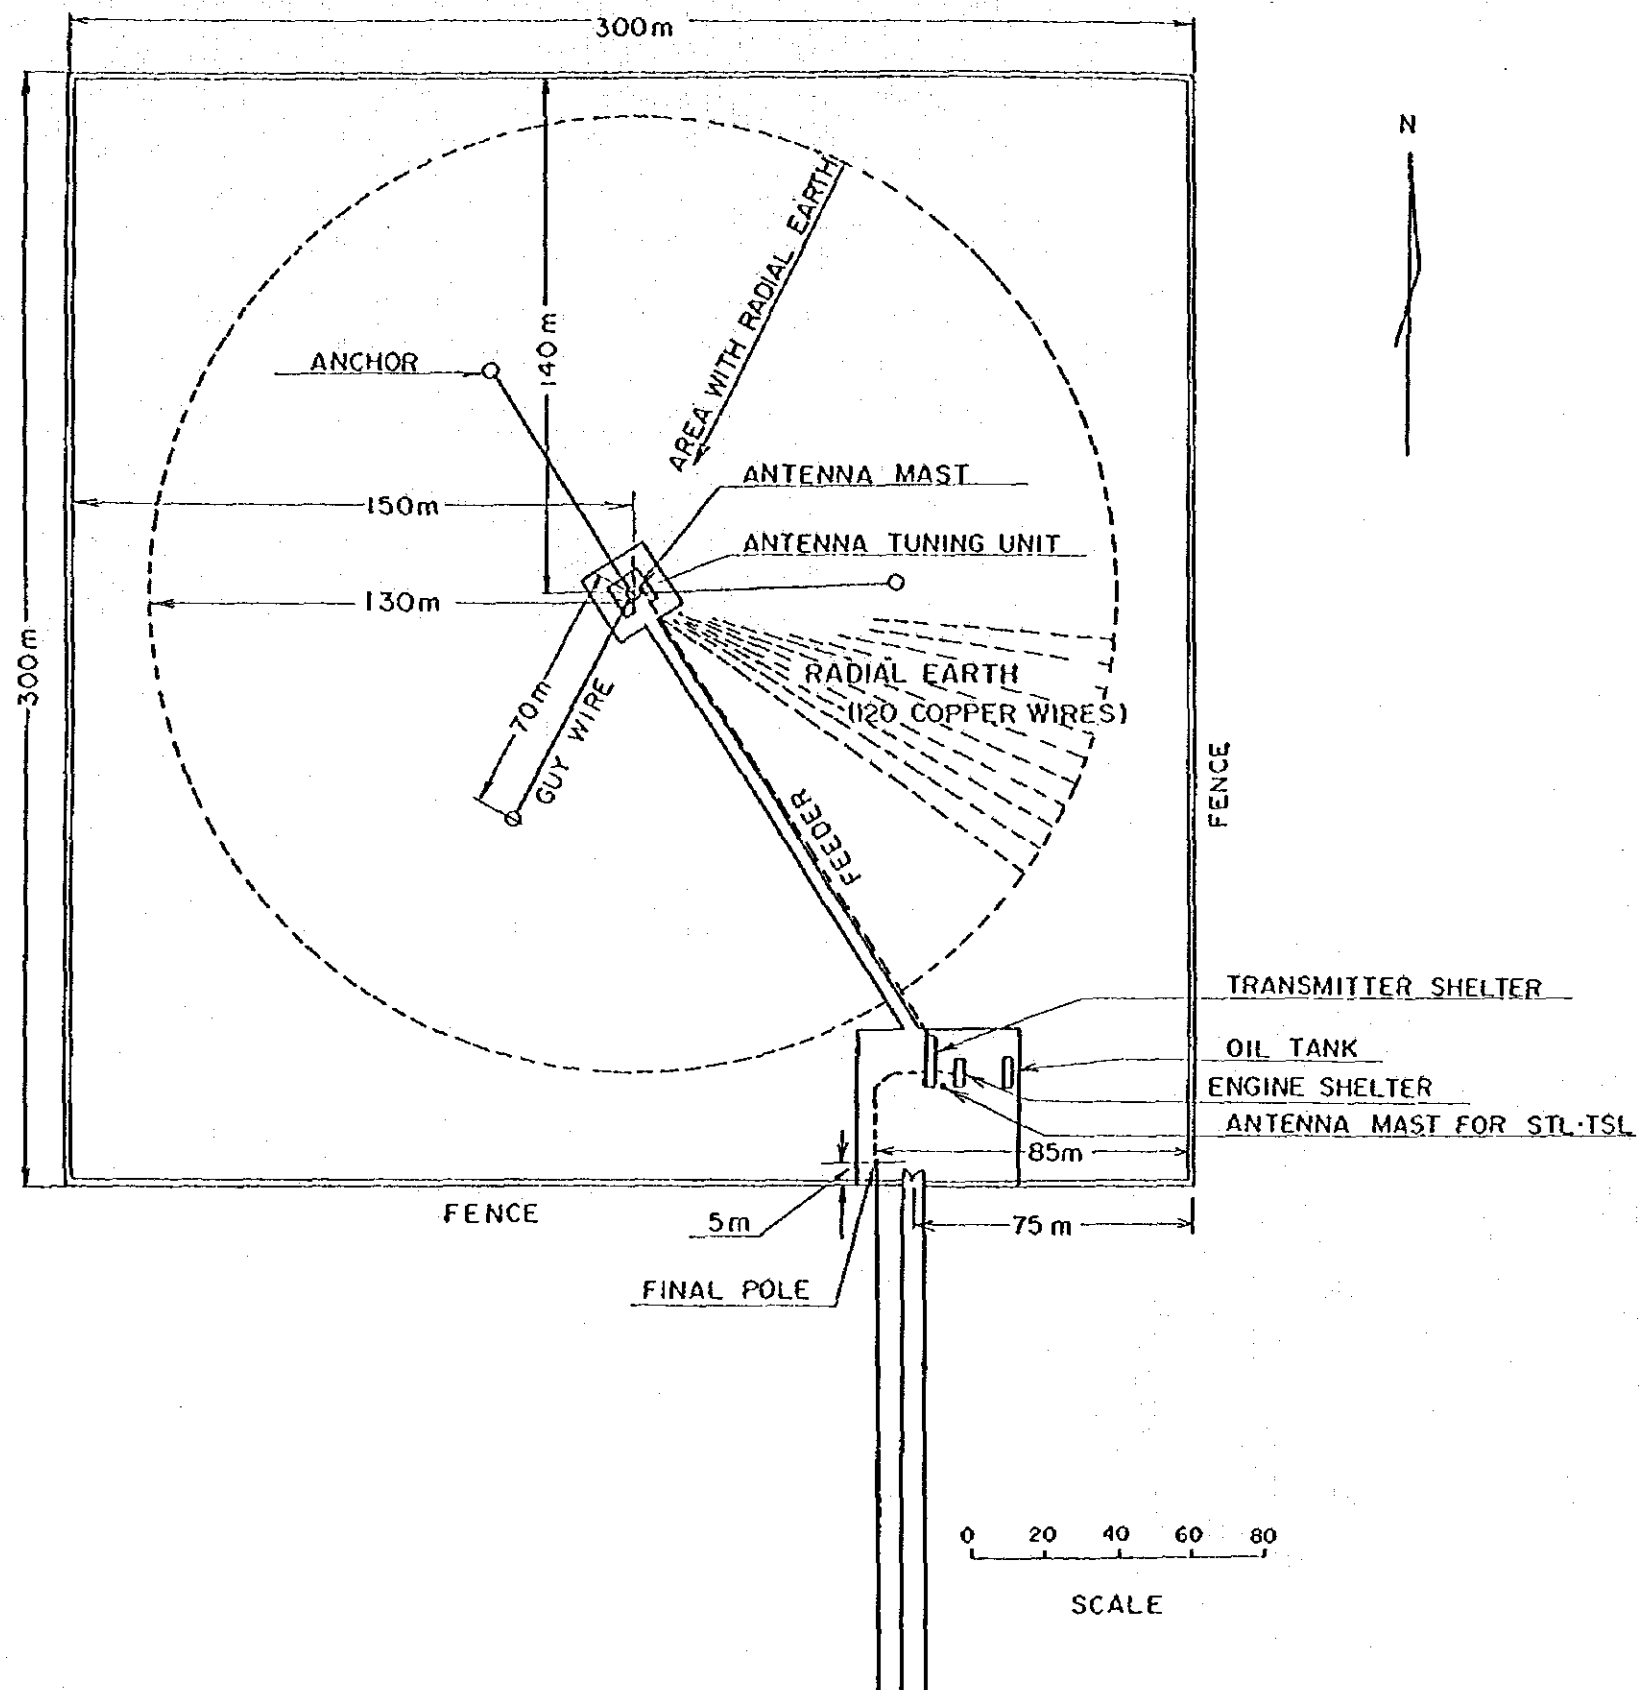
Site Plan for Kosti Transmitting Station
